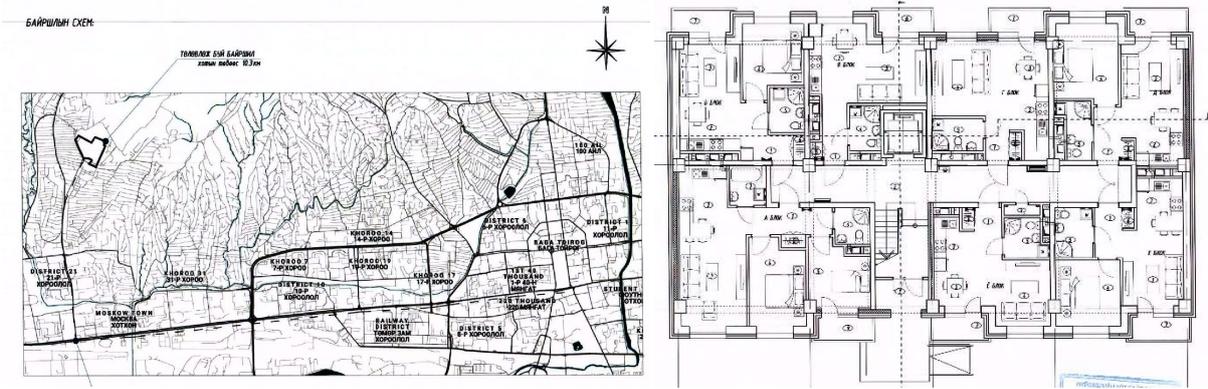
Location (left) and Floor Plan (right) of Deteriorated Housing Recovery Project
